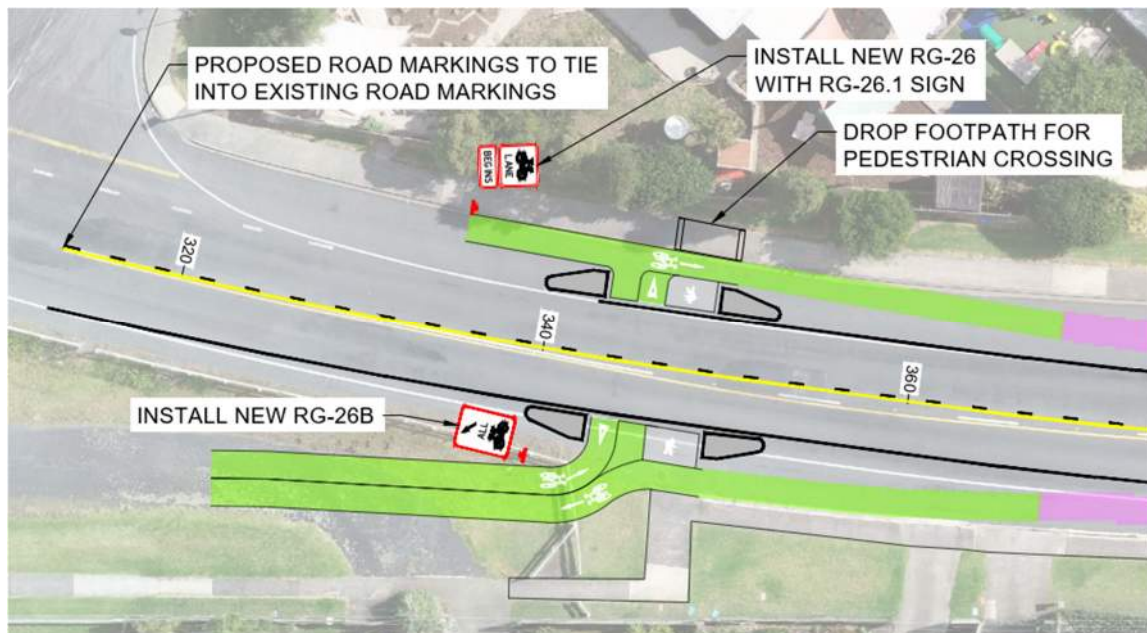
Proposed plan of the crossing point on Marsden Point Road (RP 345m)
